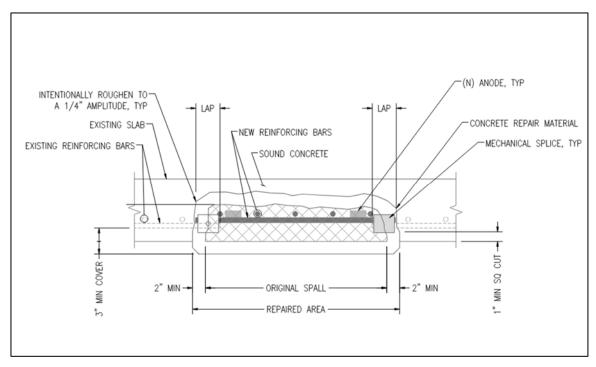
Concrete Spall Repairs – Sides and Soffit
